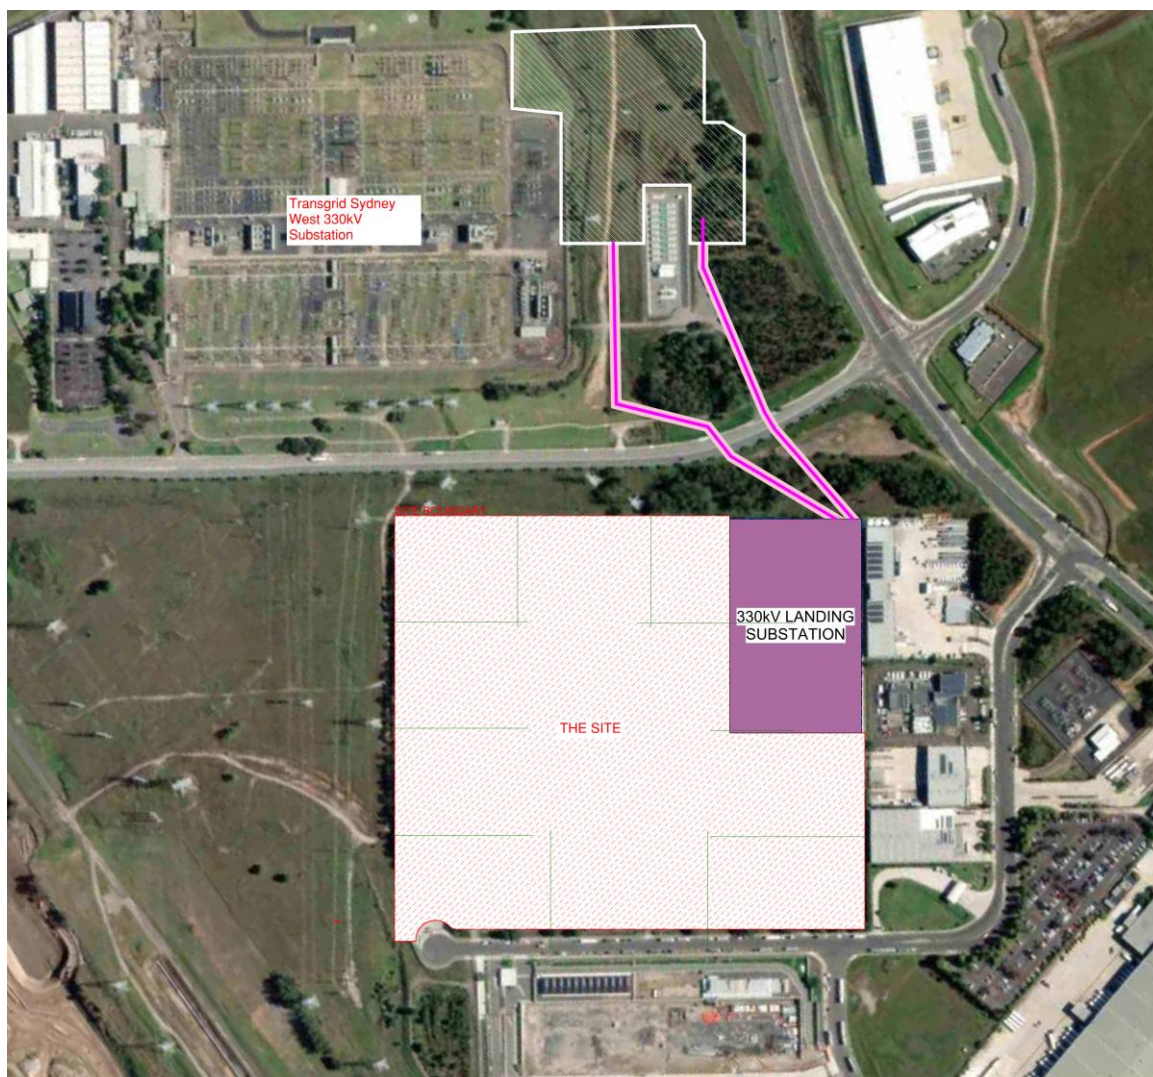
Site Plan (Source: Grimshaw Architects)
